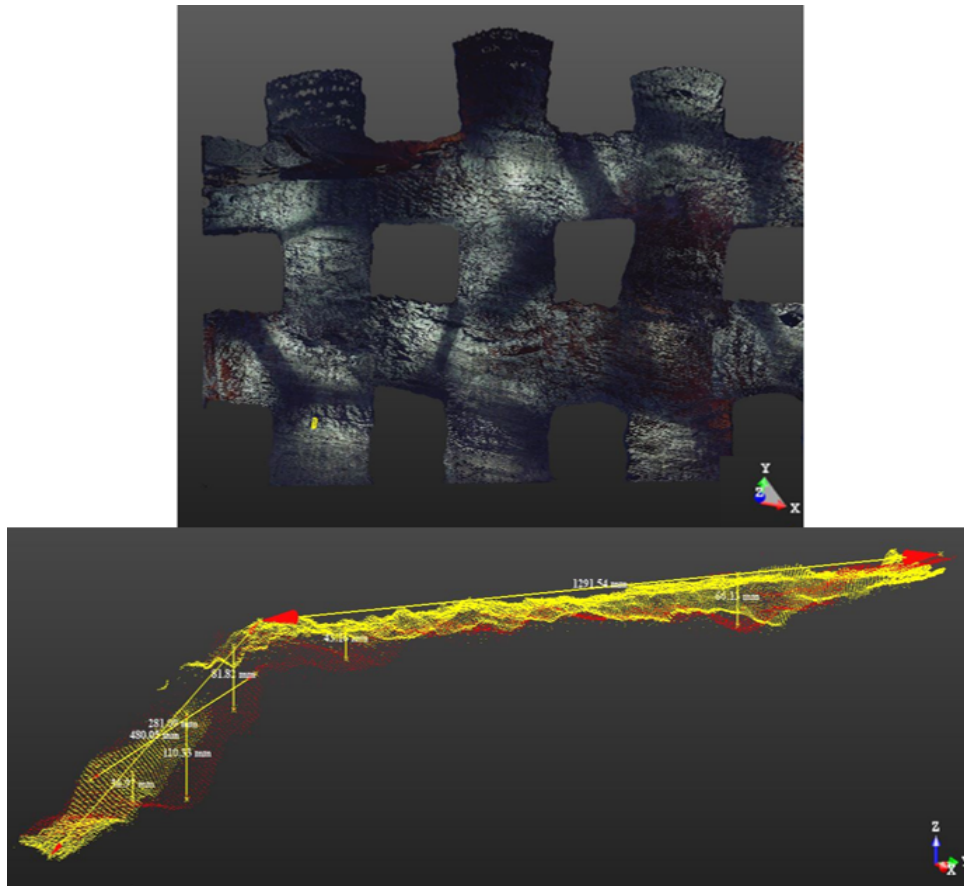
Evaluation ceiling deformations of 22 room on G alignment
